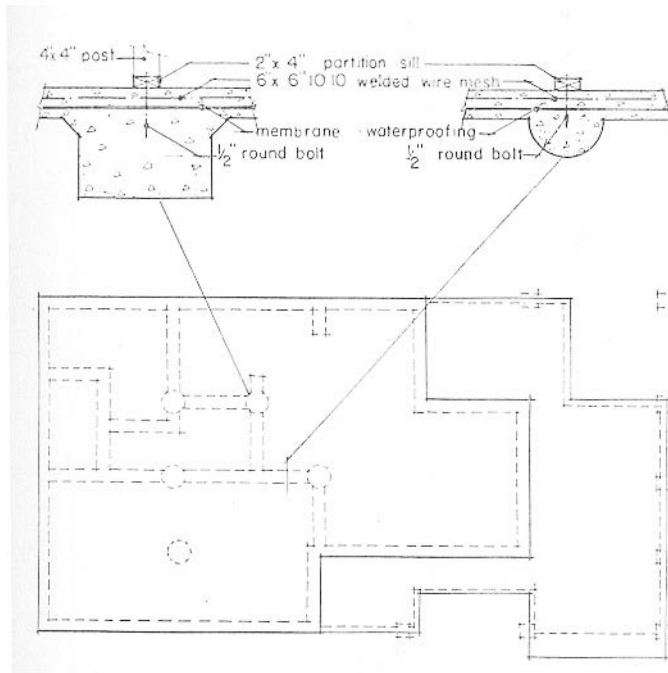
11 Foundation plan for "Plan A" at Sherman Park in Reseda. Note post supports for beams that free up open plan for kitchen, dining and living room area. "The Fickett Formula," *House and Home*, March 1953, 134. Permission pending.
